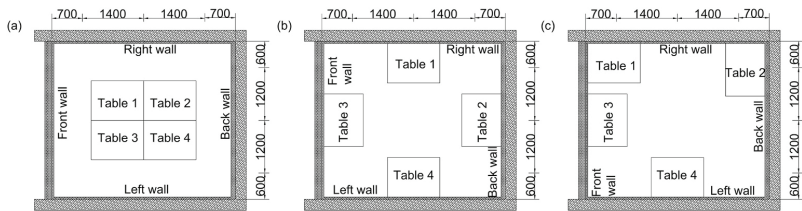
Tables (a) in the middle, (b) close to walls, and (c) close to corners or walls.
